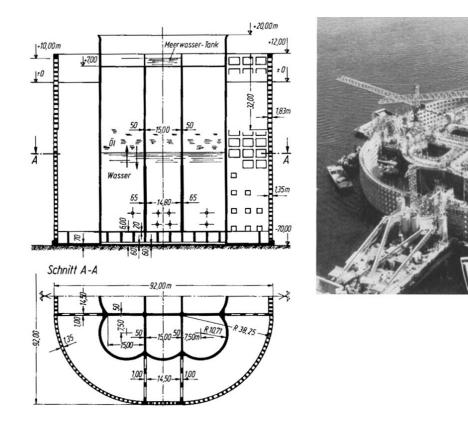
Artificial island - Ekofisk, constructed 1972-1973 using concrete caissons (source unknown)
